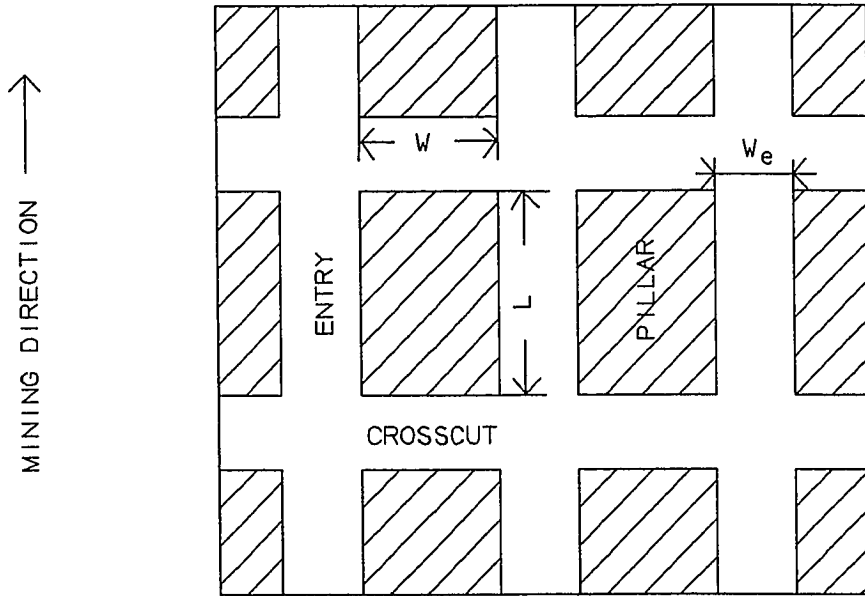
A typical room-and-pillar mining layout(after Peng, 1986).
